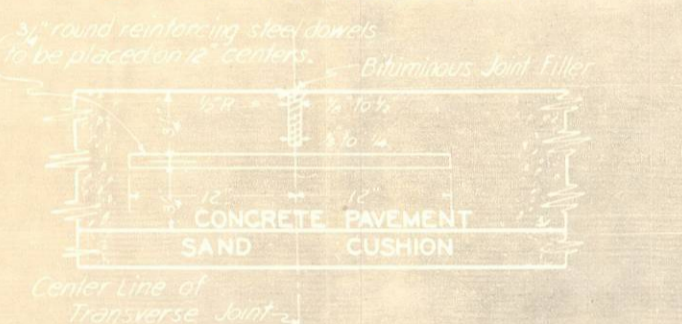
DETAILS OF JOINTS FOR CONCRETE PAVEMENT
